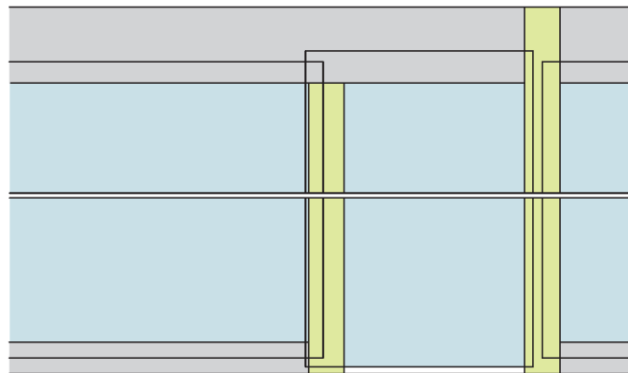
TYPICAL CROSS-SECTION OF GLAZED WALL PANEL
